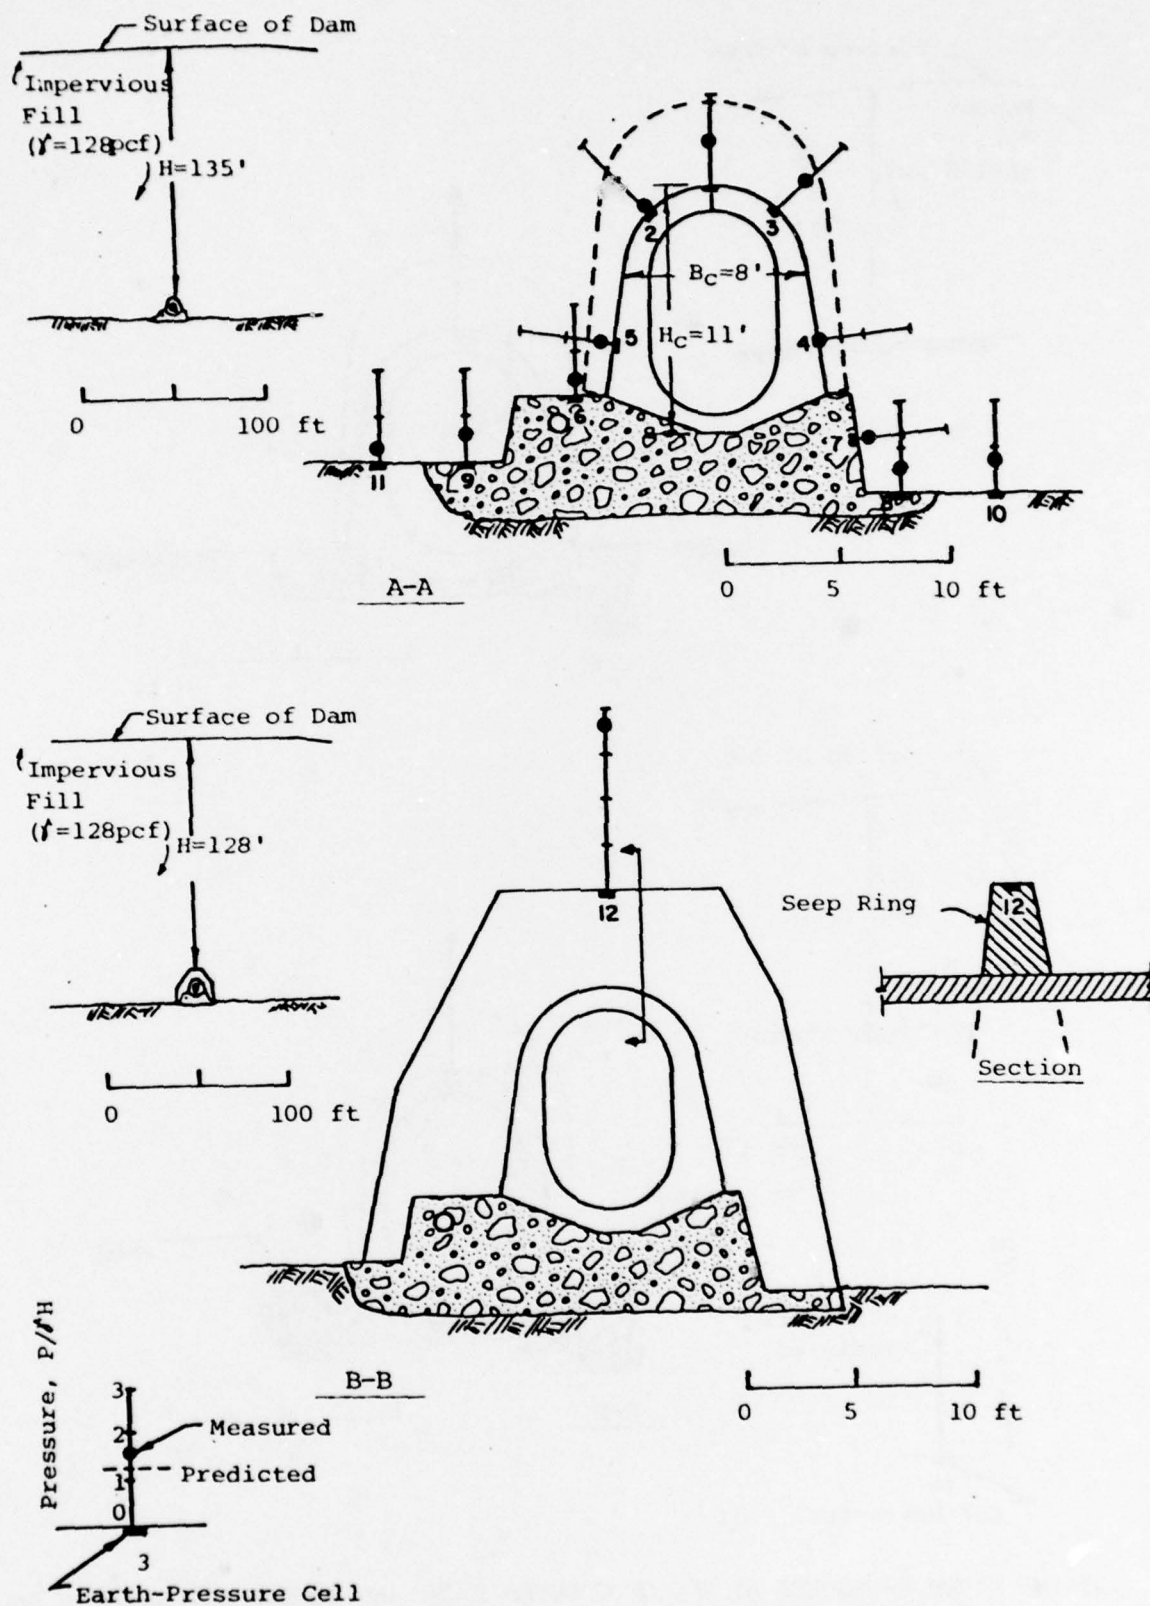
EARTH PRESSURES AT END OF CONSTRUCTION, INSTRUMENT STATIONS A-A AND B-B, DIERKS LAKE DAM
